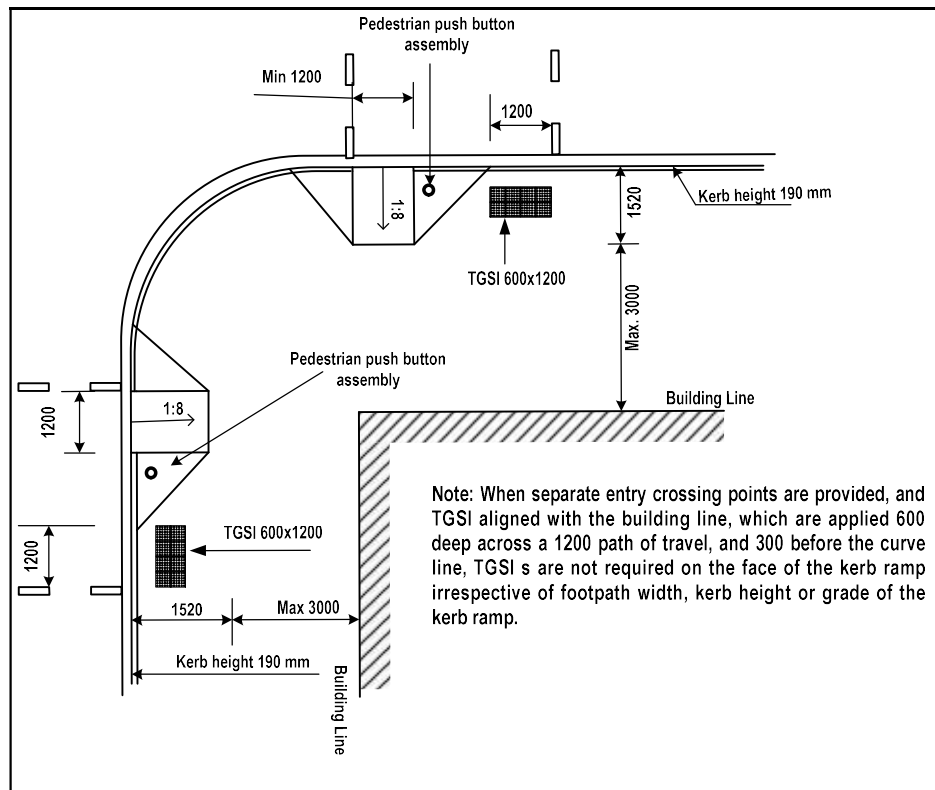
Right angle intersection &, dual separate entry crossing top of the ramp within 3m of the building line
